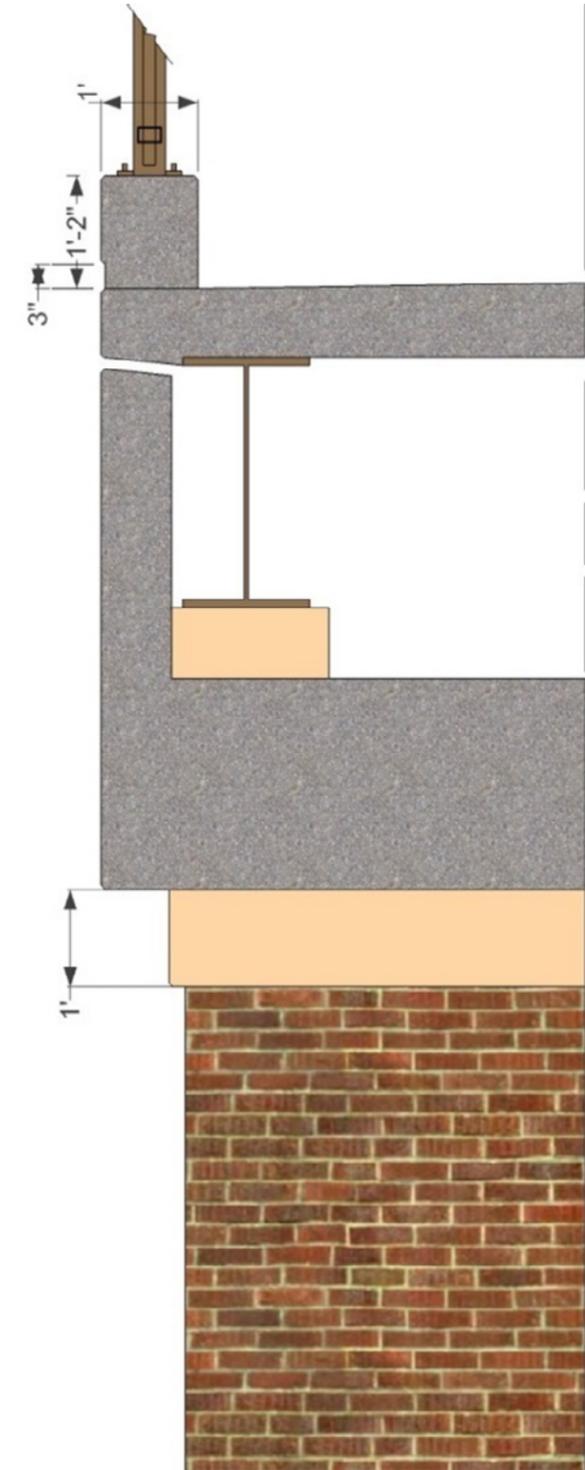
Pedestrian Bridge Column – Partial Section View A-A
